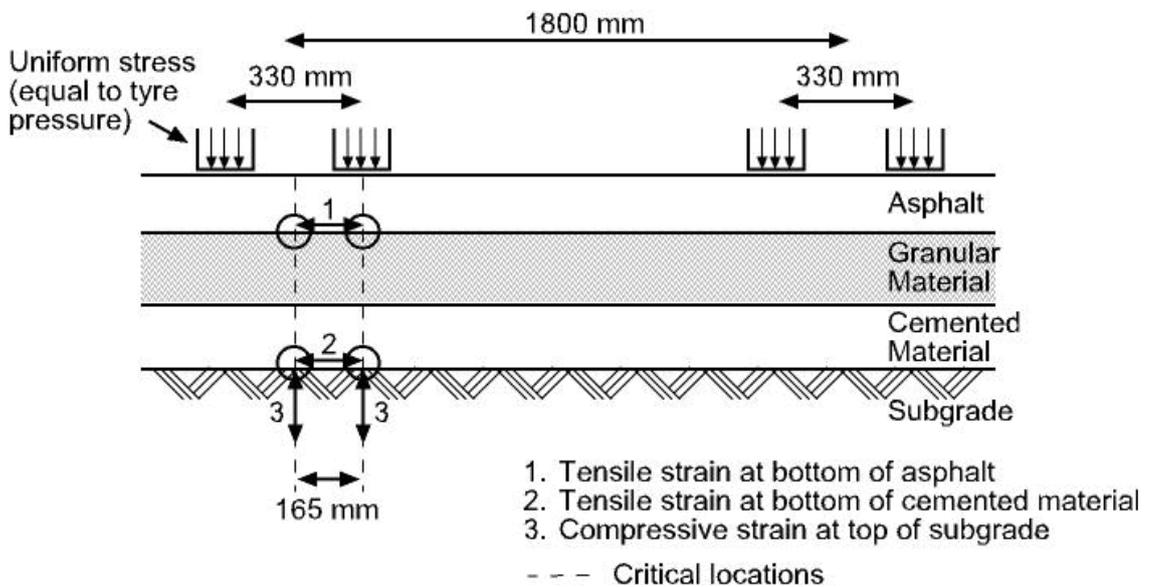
Austroads layered pavement model (Austroads 2008)
